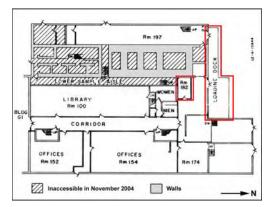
G2 337-Foot Level, Room 182 and the Loading Dock
